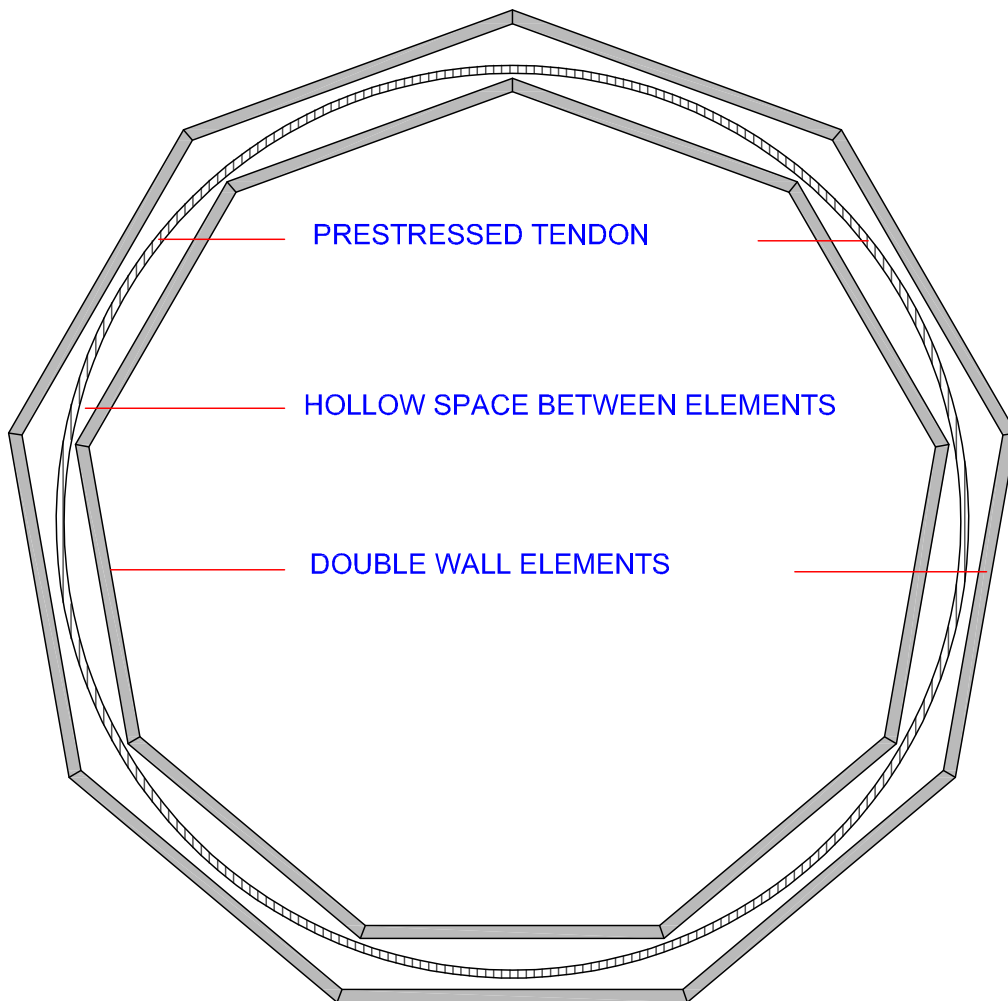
Arranging of prestressed tendons in order to secure the set up geometry and as alternative horizontal reinforcement
